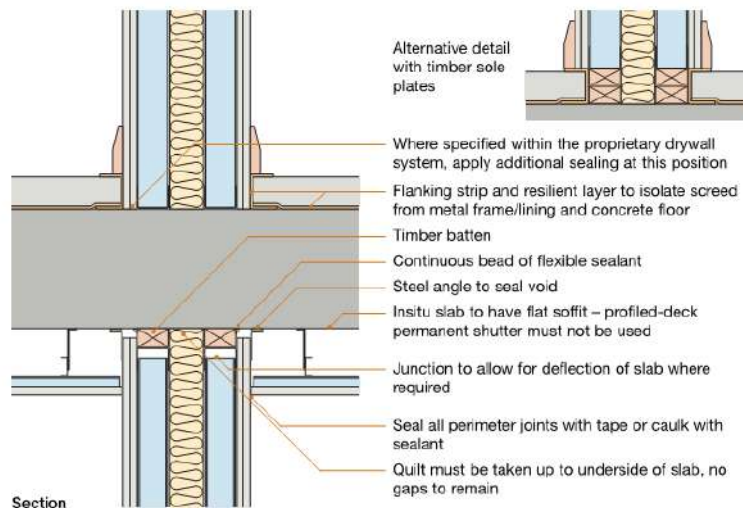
Indicative separating wall to separating floor junction detailing for steel frame drylining party wall construction wall construction
